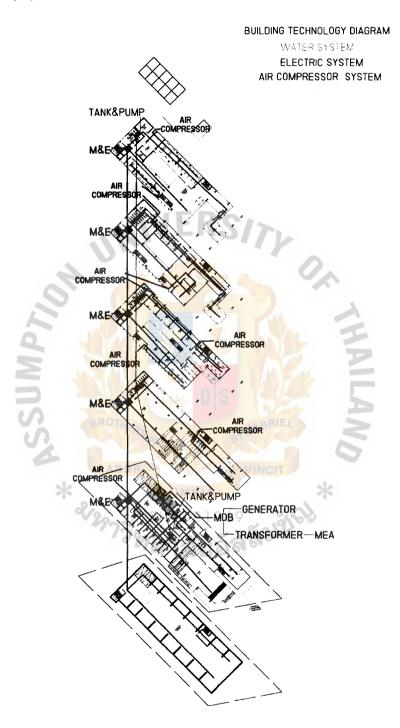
Diagram showing building systems (Image Source: Author's image)
